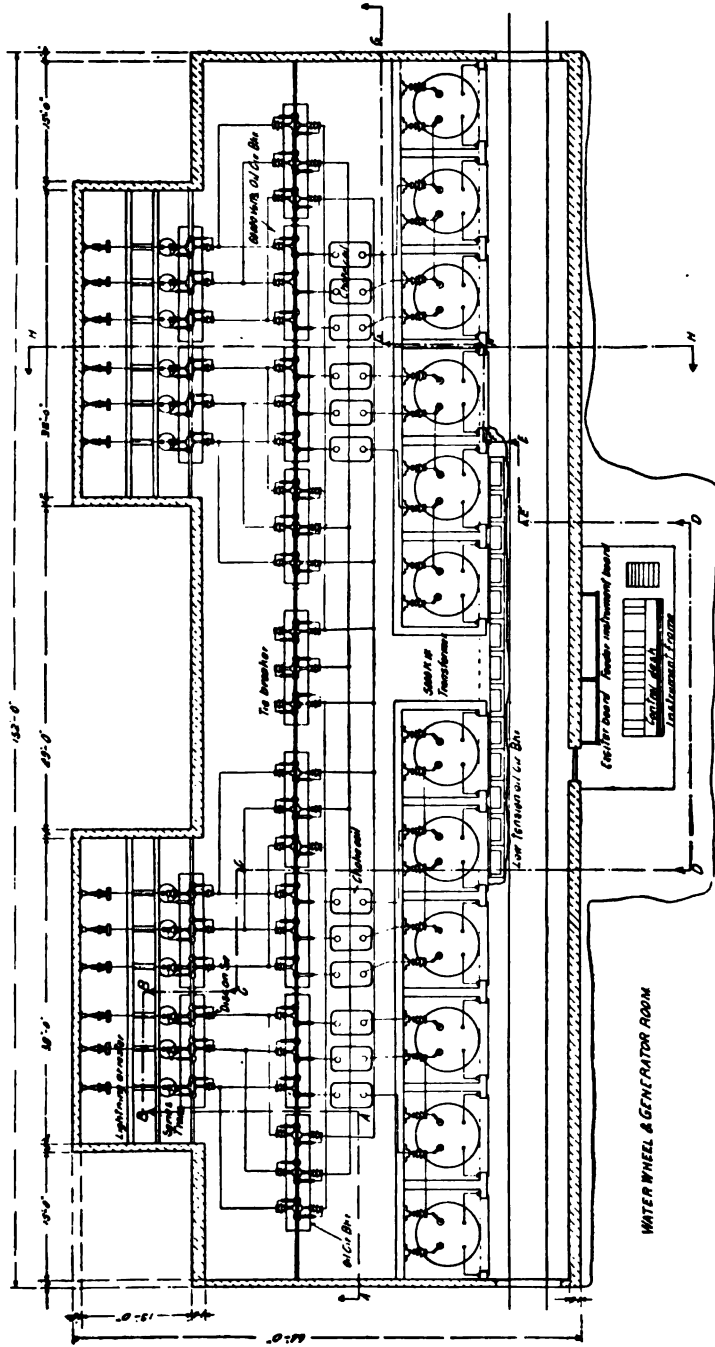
Plan of transformer and switching house, 60,000-volt plant
